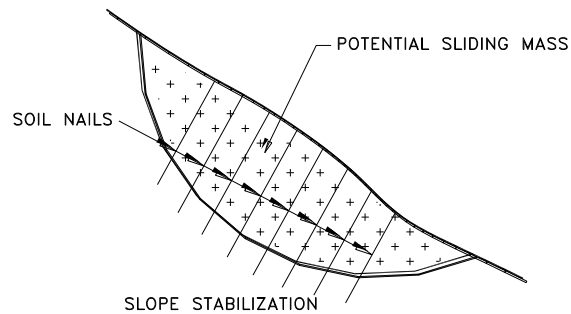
SOIL NAILING OF A FAILURE PRONE SLOPE
